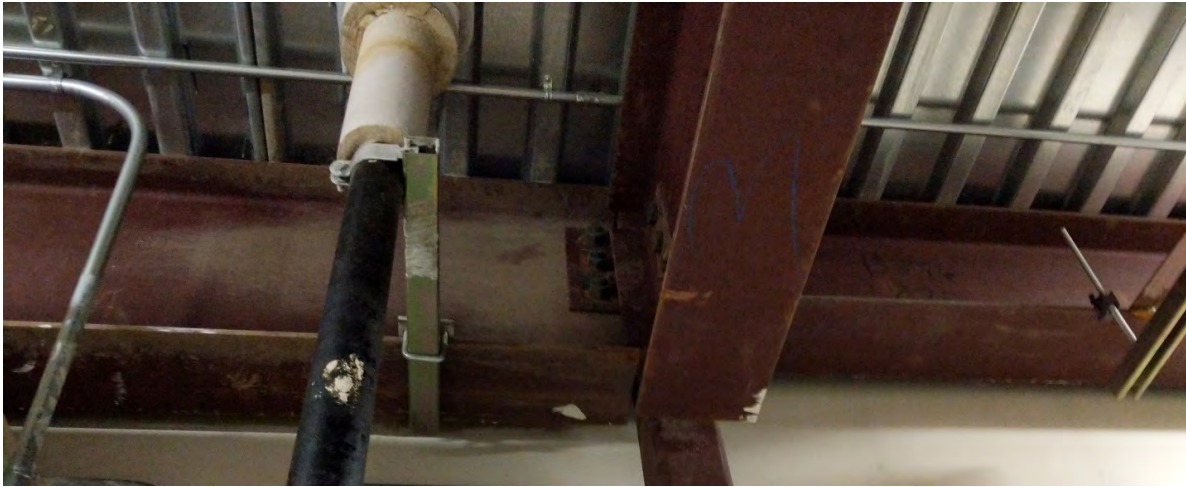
Clamps missing retaining straps at the new central mechanical penthouse.
